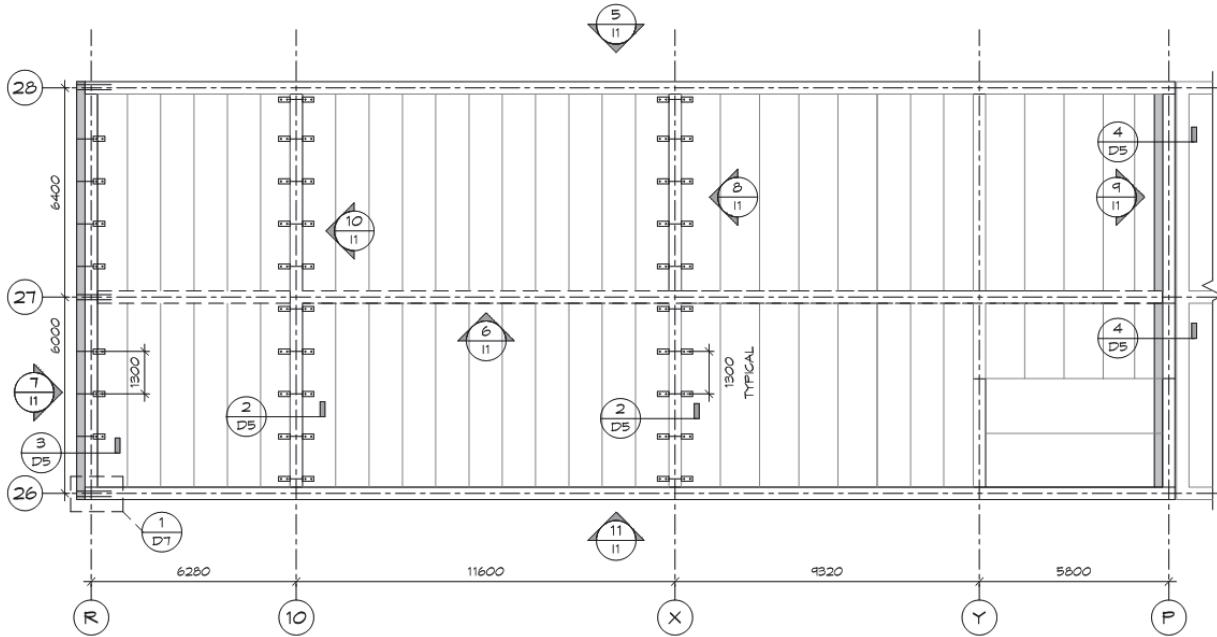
Plan showing location of transverse wall connections in CMCF Increment 1.
